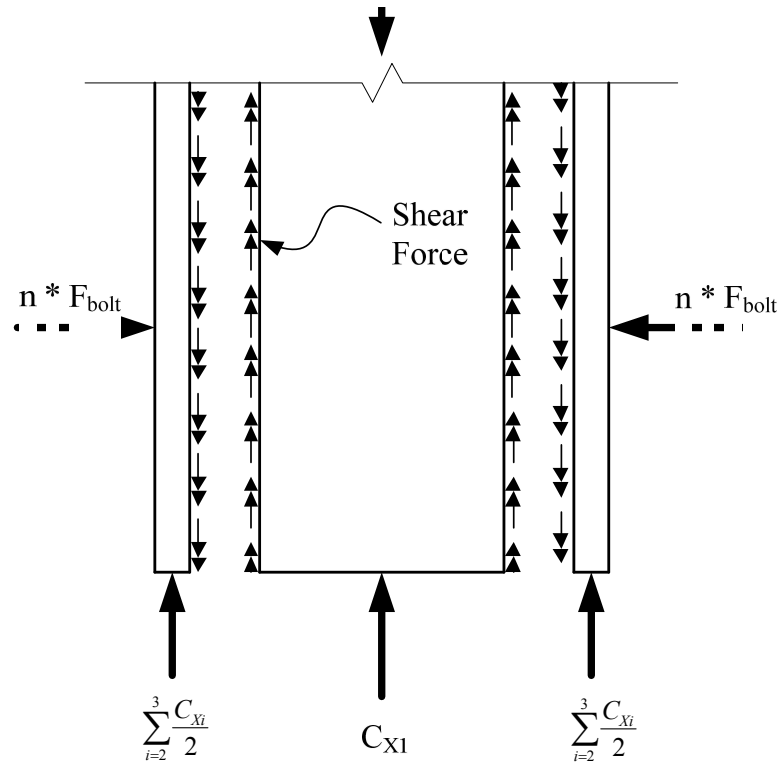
End View at Compression End of Wall Showing Shear between Concrete and Steel Wall Components Carried by Friction
